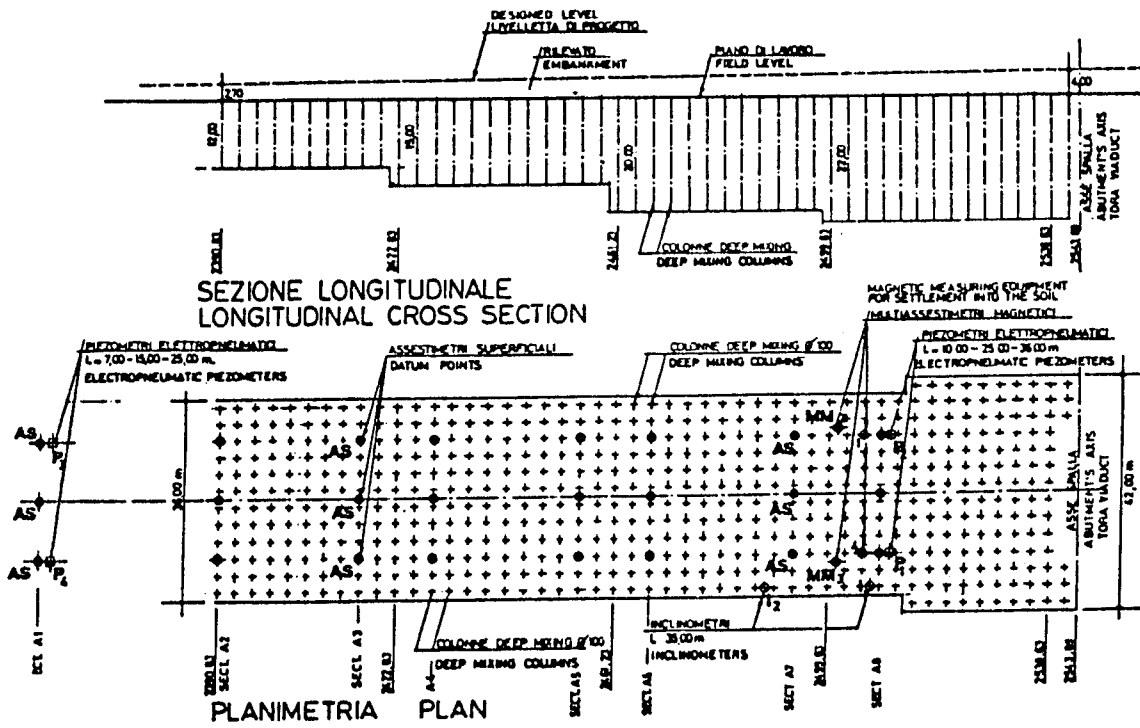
Layout of the deep mixing treatment near Tora Viaduct and of the site control instrumentation (Restelli et al., 1991).
